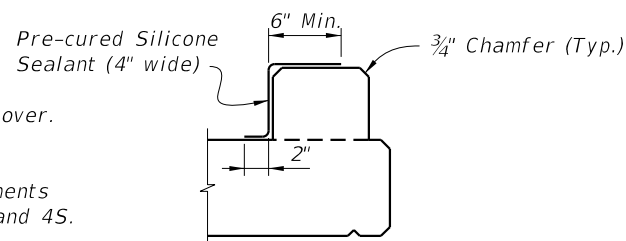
DETAIL "B" EXPANSION JOINT (FIELD SPLICE SIMILAR)
